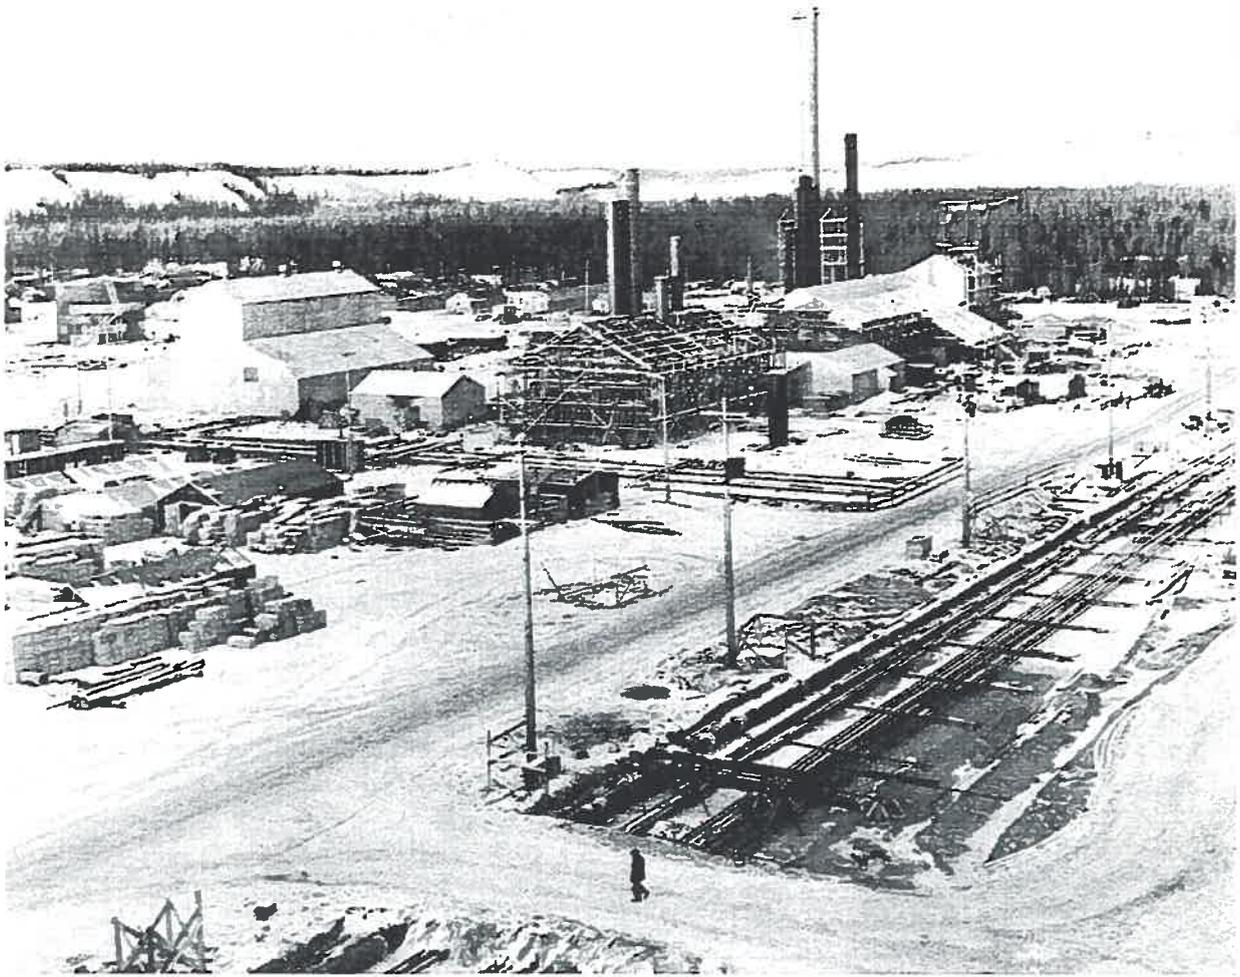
"Whitehorse Canol refinery: caustic treatment building, with alkylation unit under construction and piping trench in foreground. 29 October 1943." YA. Finnie Coll., PHO 141. 456.
